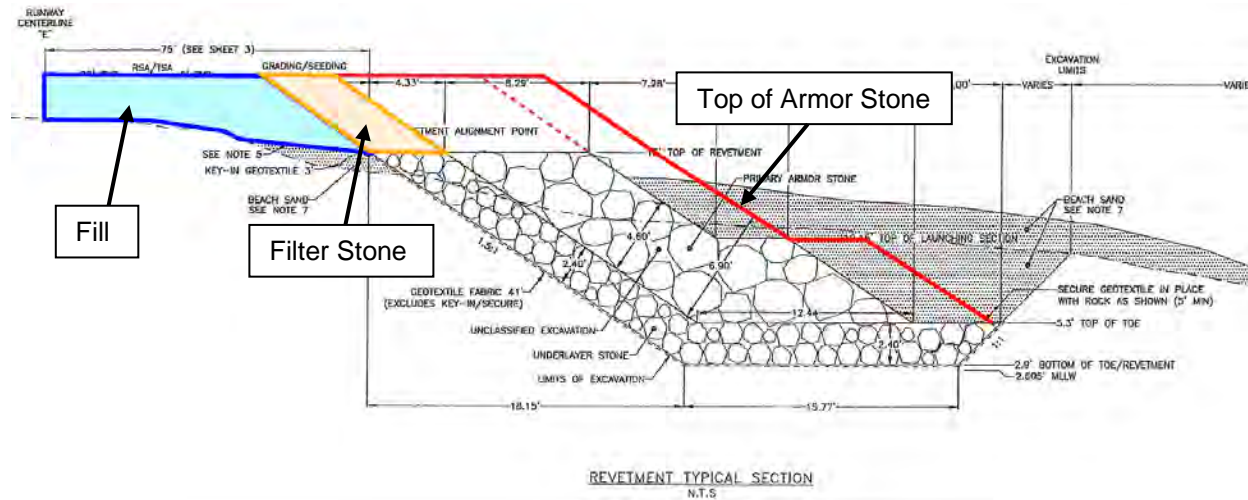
Alternative 2: Raising the runway and placing additional armor stone
